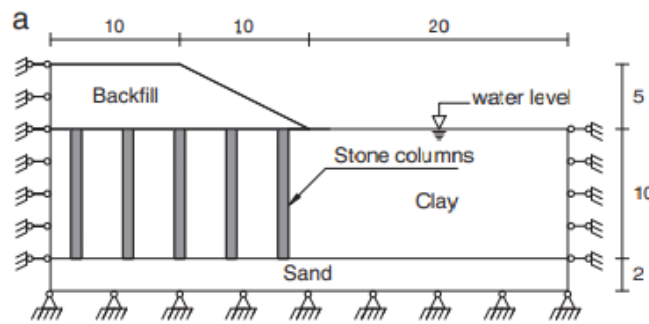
Stone Column Reinforced Embankment (Abusharar & Han, 2011).
